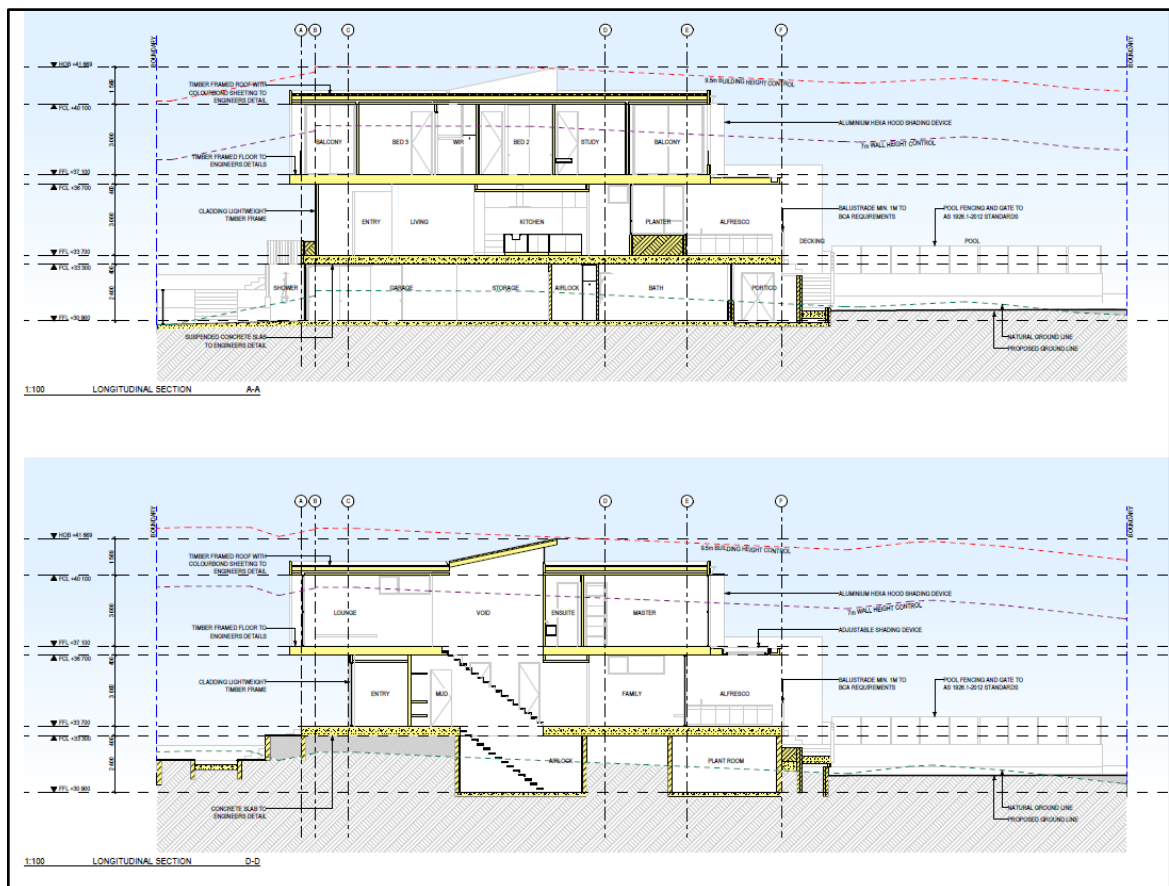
Proposed Longitudinal Sections (A-A and D-D)
